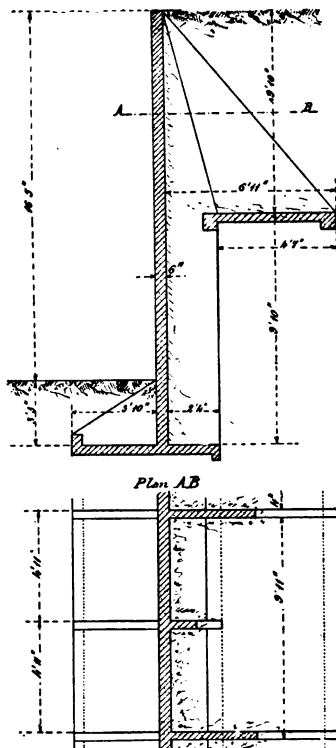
Reinforced Concrete Retaining Wall with a platform at Mid-height.
